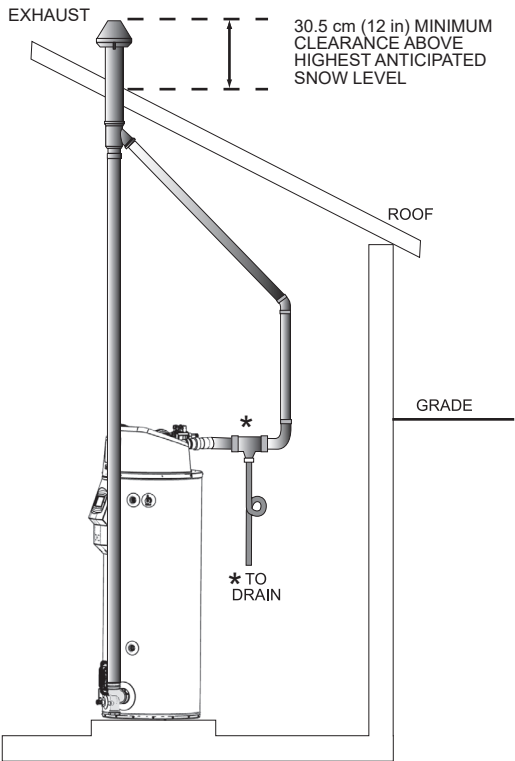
Direct Vent, Pitched Roof, Concentric Termination
